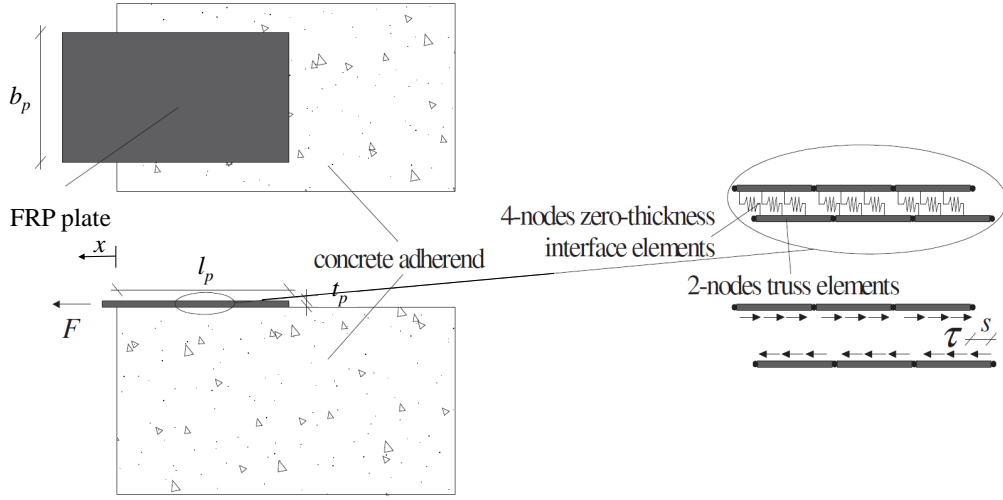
Single-lap shear test of a FRP-to-concrete bonded joint.
